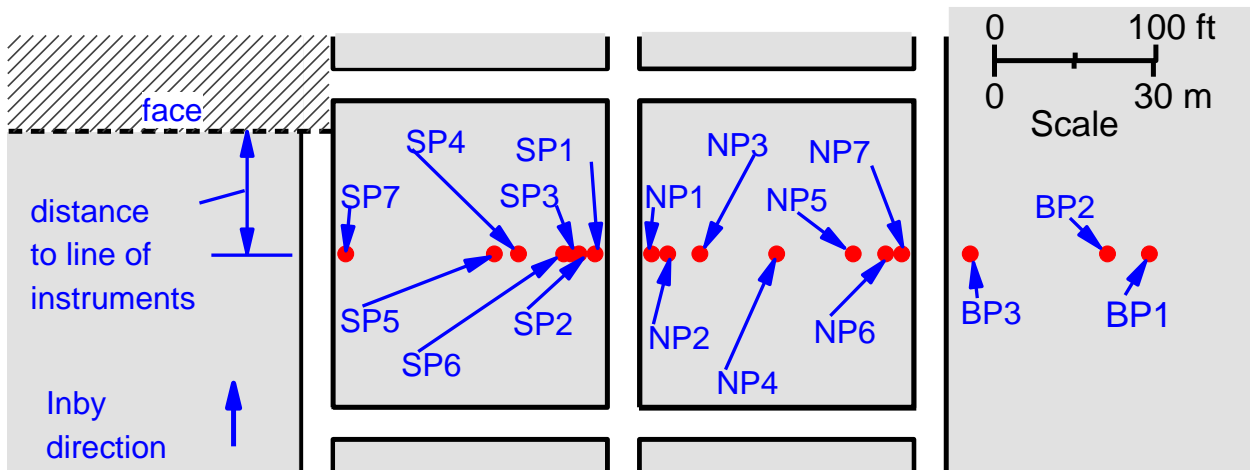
Plan view of 2 North pillars and barrier pillar at outby site with locations of borehole pressure cells.
